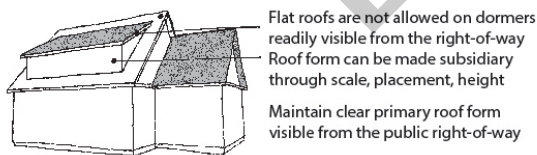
G: DORMERS AND SUBSIDIARY ROOFS
